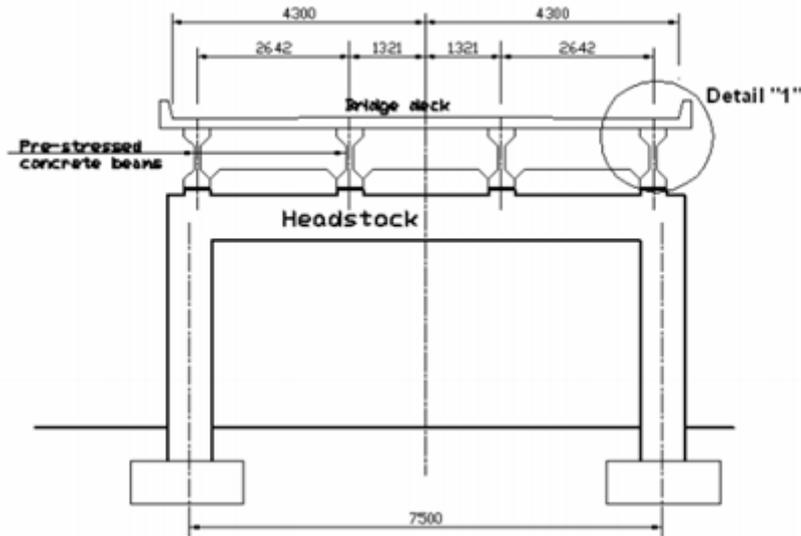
SECTION DETAIL OF THE TENTHILL CREEK BRIDGE (SETUNGE ET AL., 2002)
